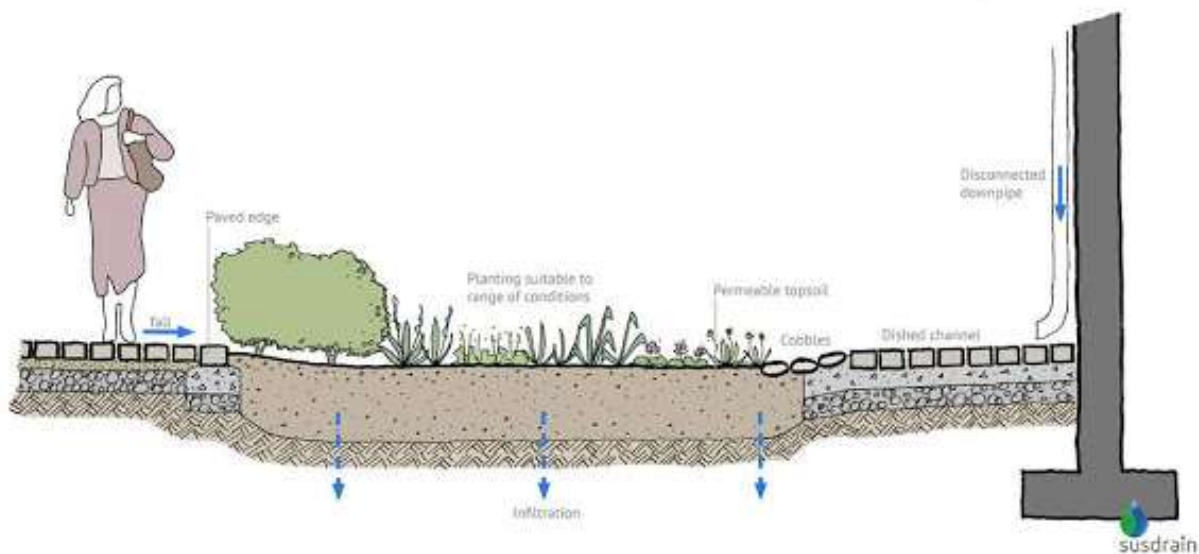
Drainage into linear raingardens (courtesy of SusDrain)
